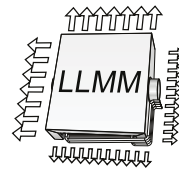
Example of nozzle setting for a Parasol EX single-module unit, LLMM
